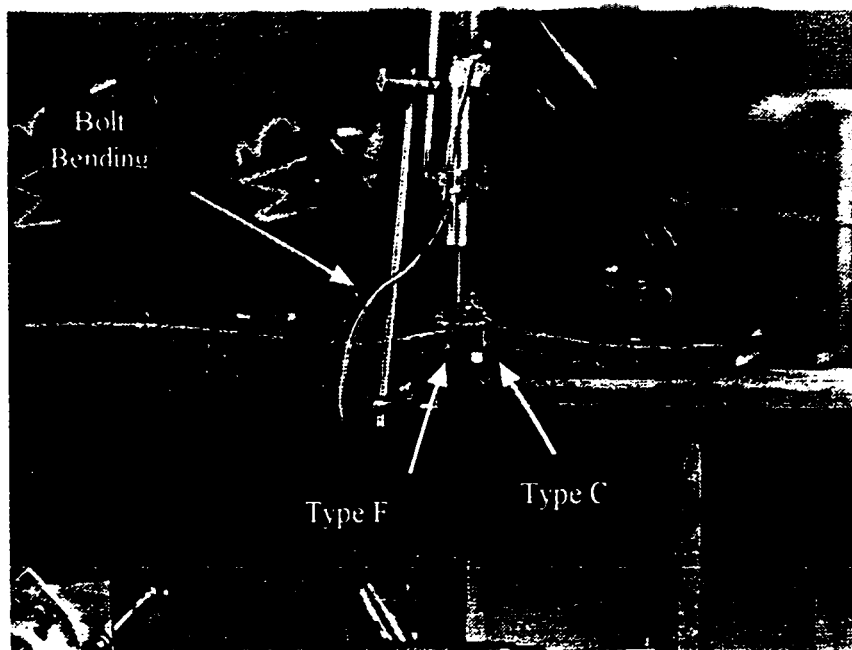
Type C and F cracks, extending through end plate M-3 (at failure)
